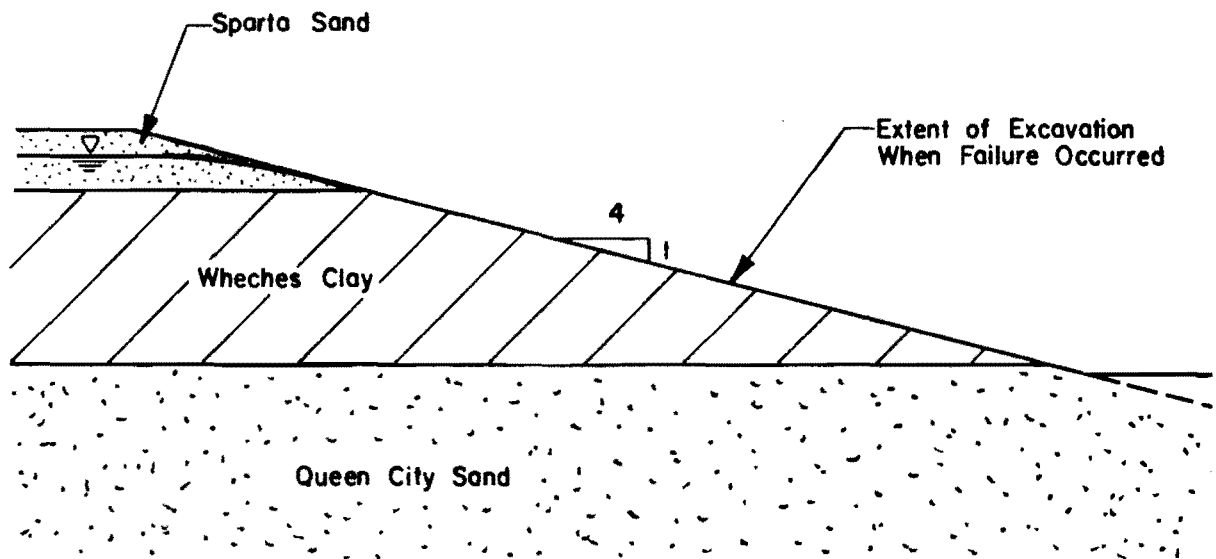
Cross section of slope which failed along I.H. 45 near Centerville.
